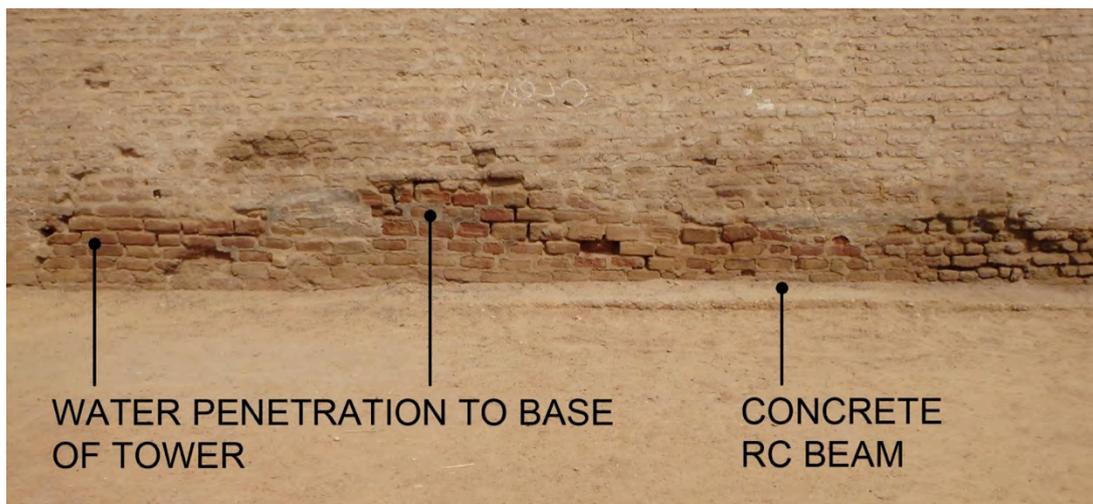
Diagnostic of condition at tower base showing the top of the reinforced concrete beam and water damage.
